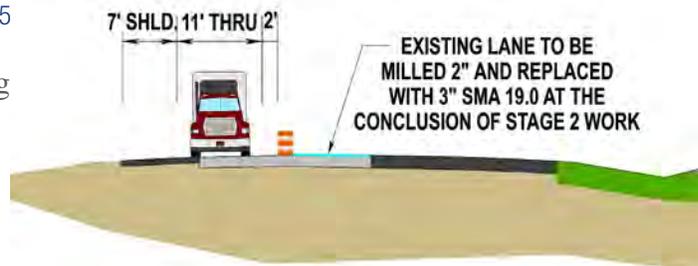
Pavement Build-up of Existing Travel Lanes
